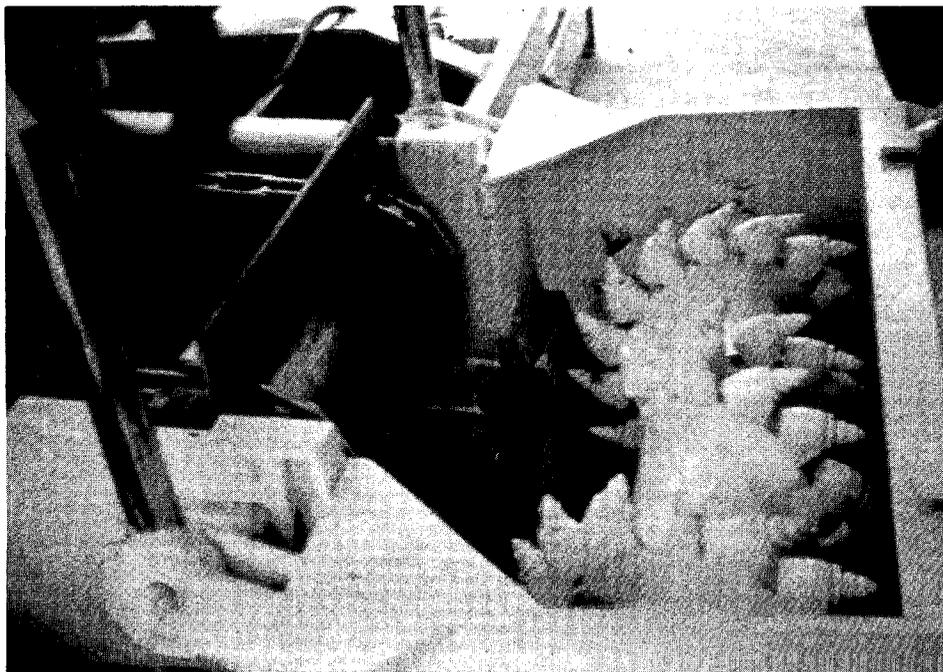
Milling heads of "Unit A". Removes the top inch of heated material. Milling heads remove the outside 5 feet from each side of the travel lane.
